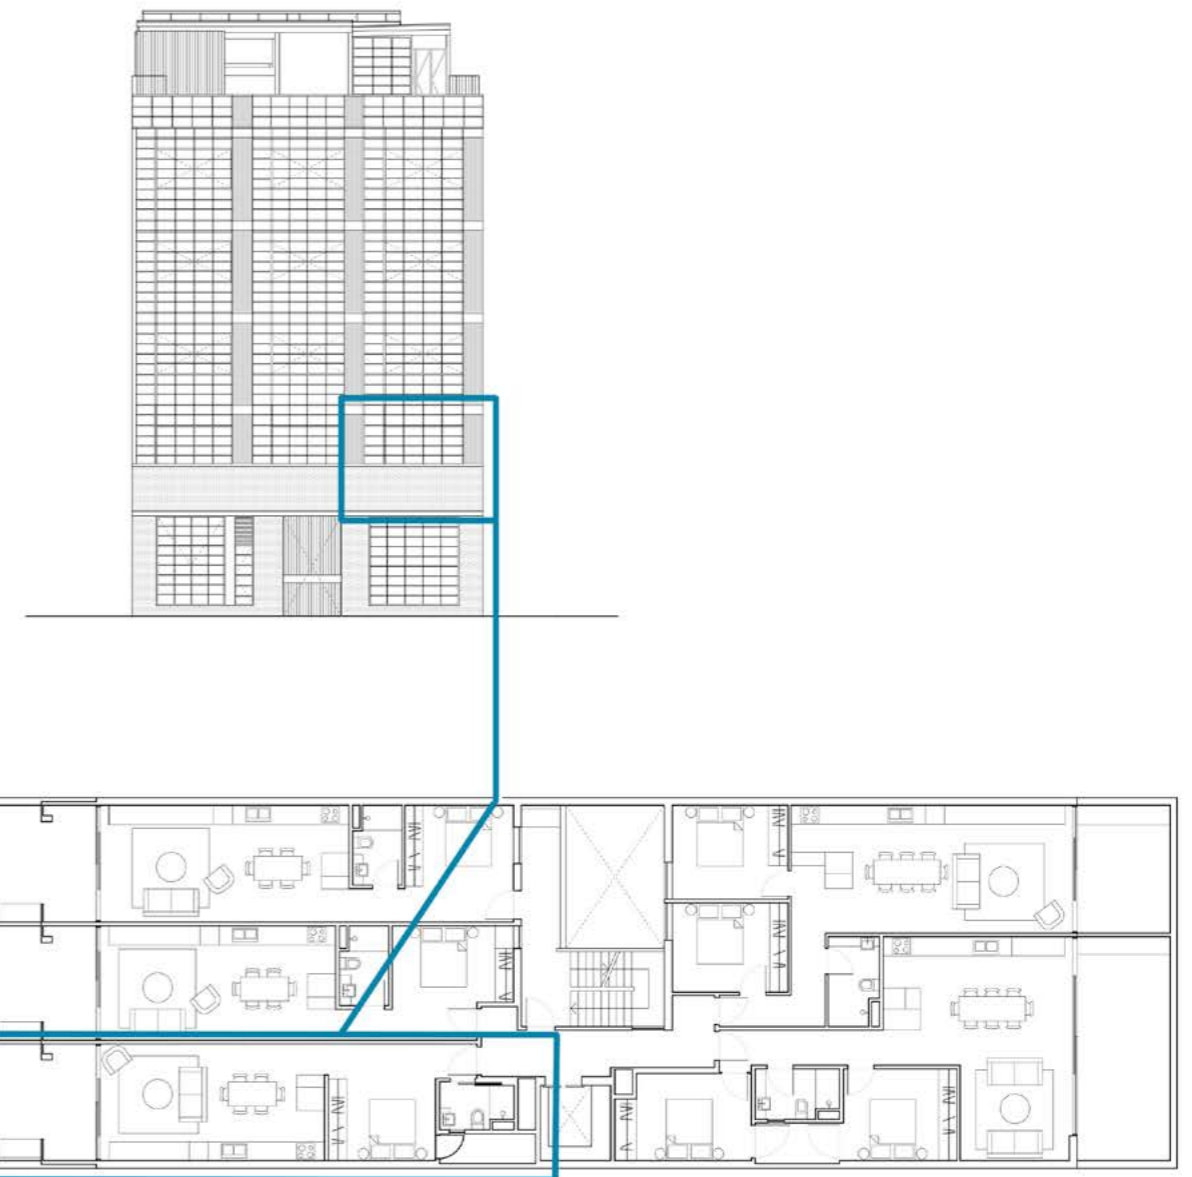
Elevation and Ground floor plan of Nightingale 1 housing development
